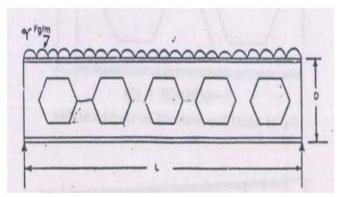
Typical castellated beam under uniformly distributed superimposed loading.
